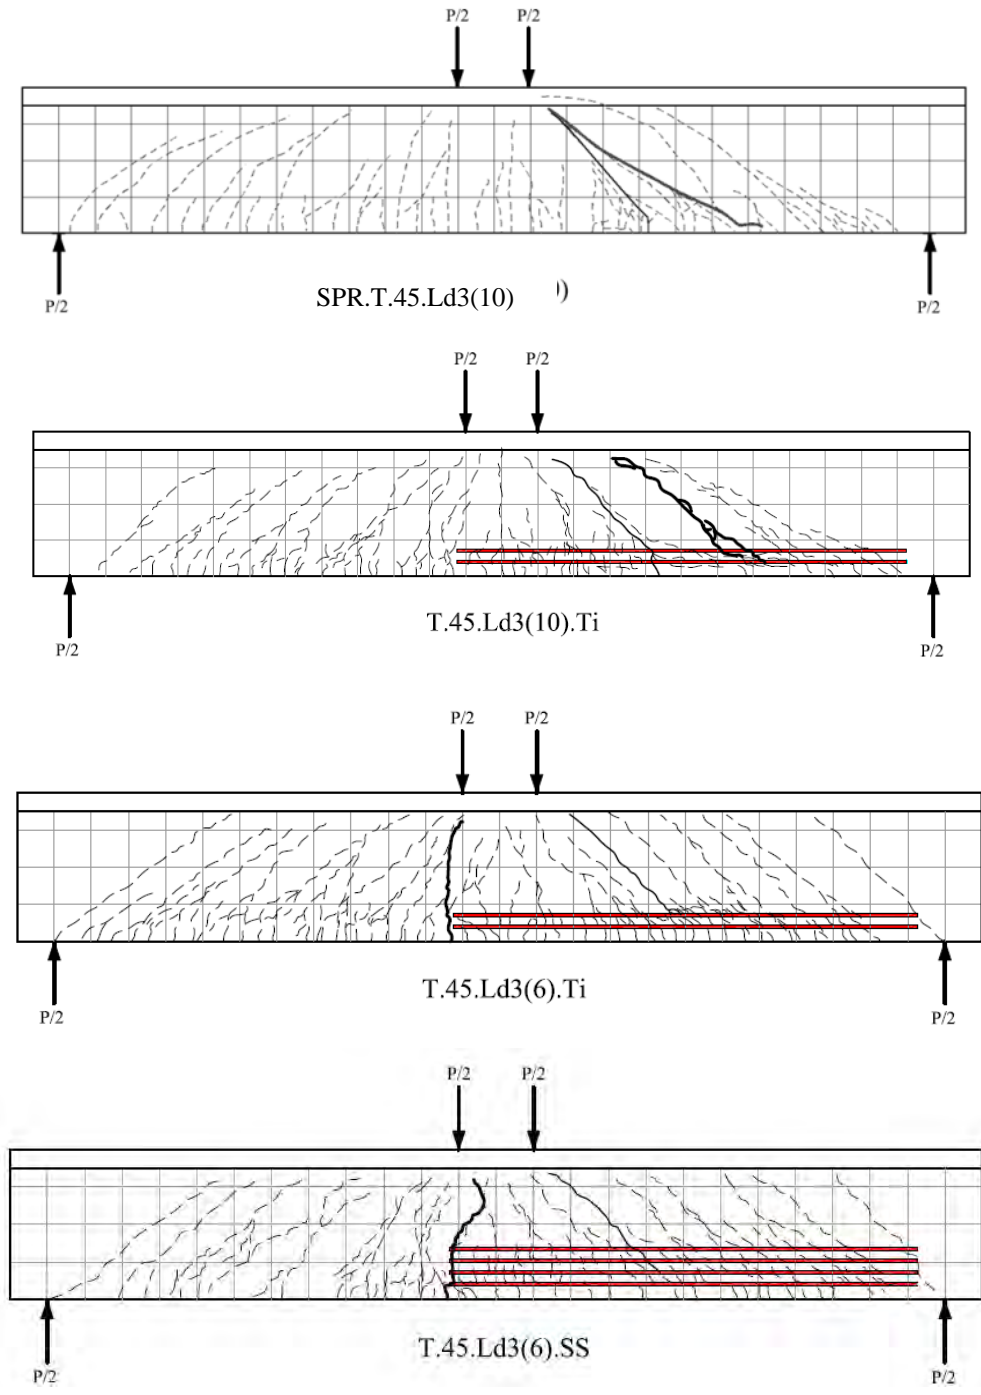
Specimen crack mapping with highlighted failure cracks.
